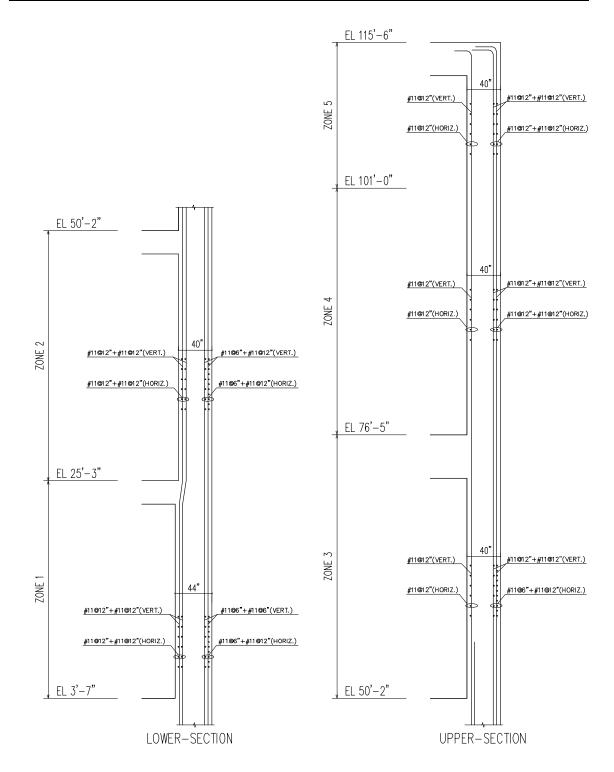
Typical Reinforcement in South Exterior Wall – SECTION 4
